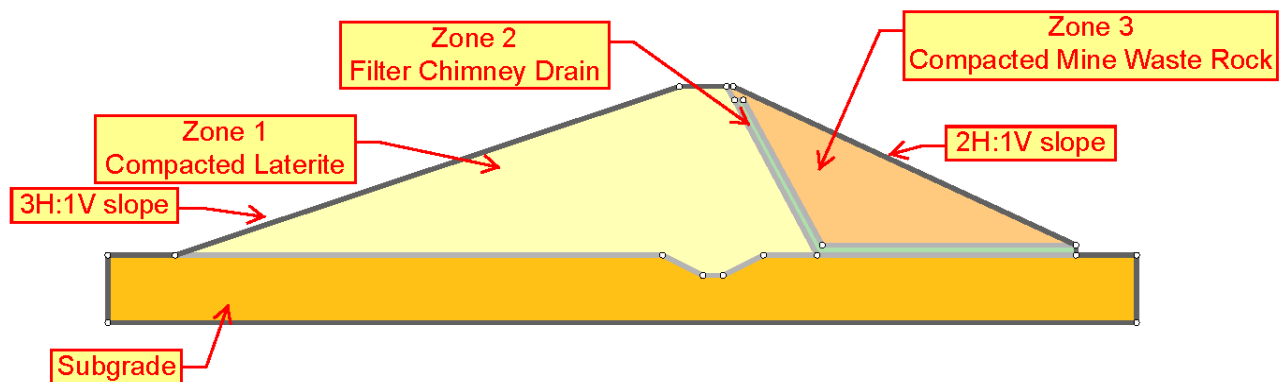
Tulu Kapi RWDD Typical Section and Construction
